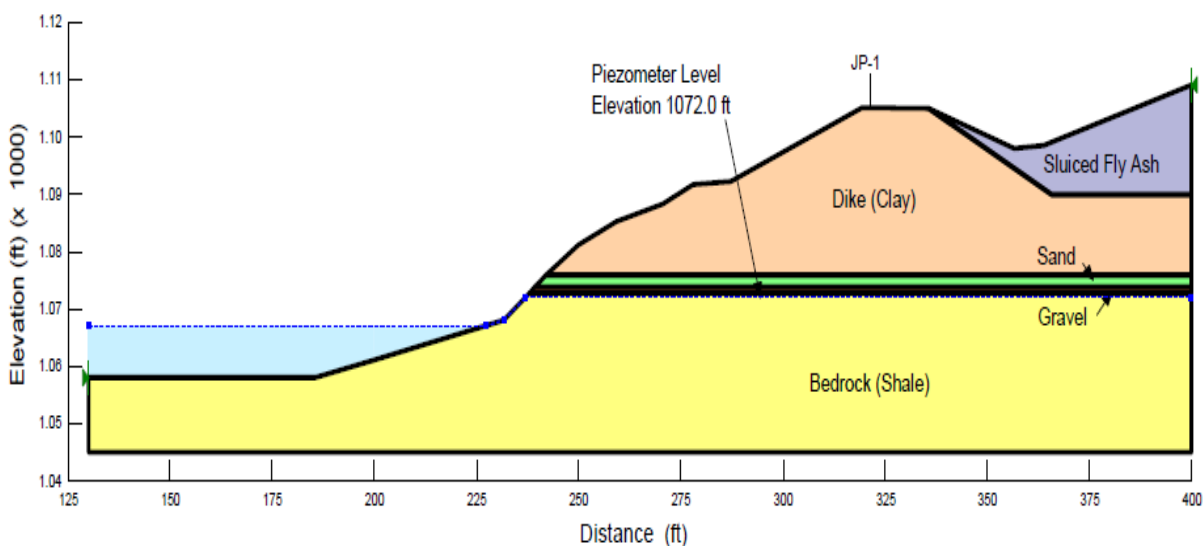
Typical Ash Disposal Area J Cross Section (East)
